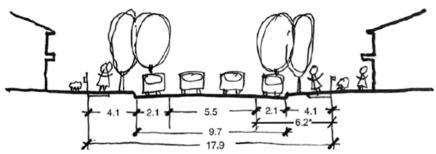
Access Street B – Typical Cross-section Source: WAPC Liveable Neighbourhoods.
